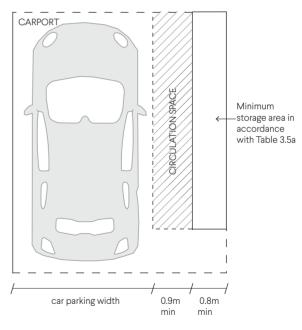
Minimum storage dimensions with adjacent circulation space
